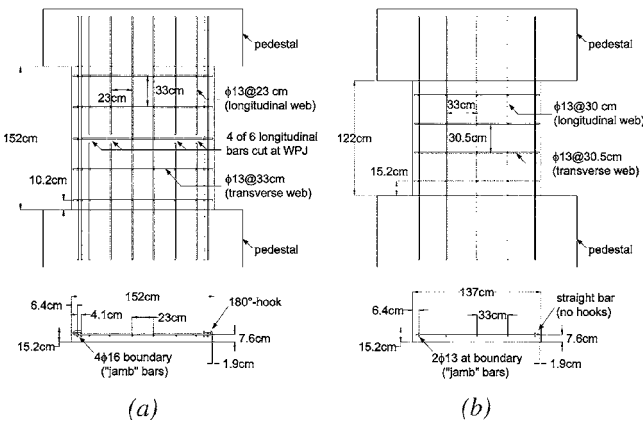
Sample wall specimen geometry and reinforcement: (a) Type 1 wall spandrel; and (b) Type 5 wall pier.
